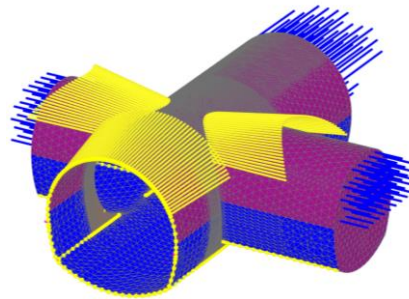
Primary support and reinforcement elements of north side tunnel (Plaxis 3D).
